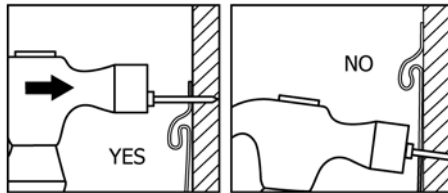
Face Nailing of Vinyl Siding Prohibited
